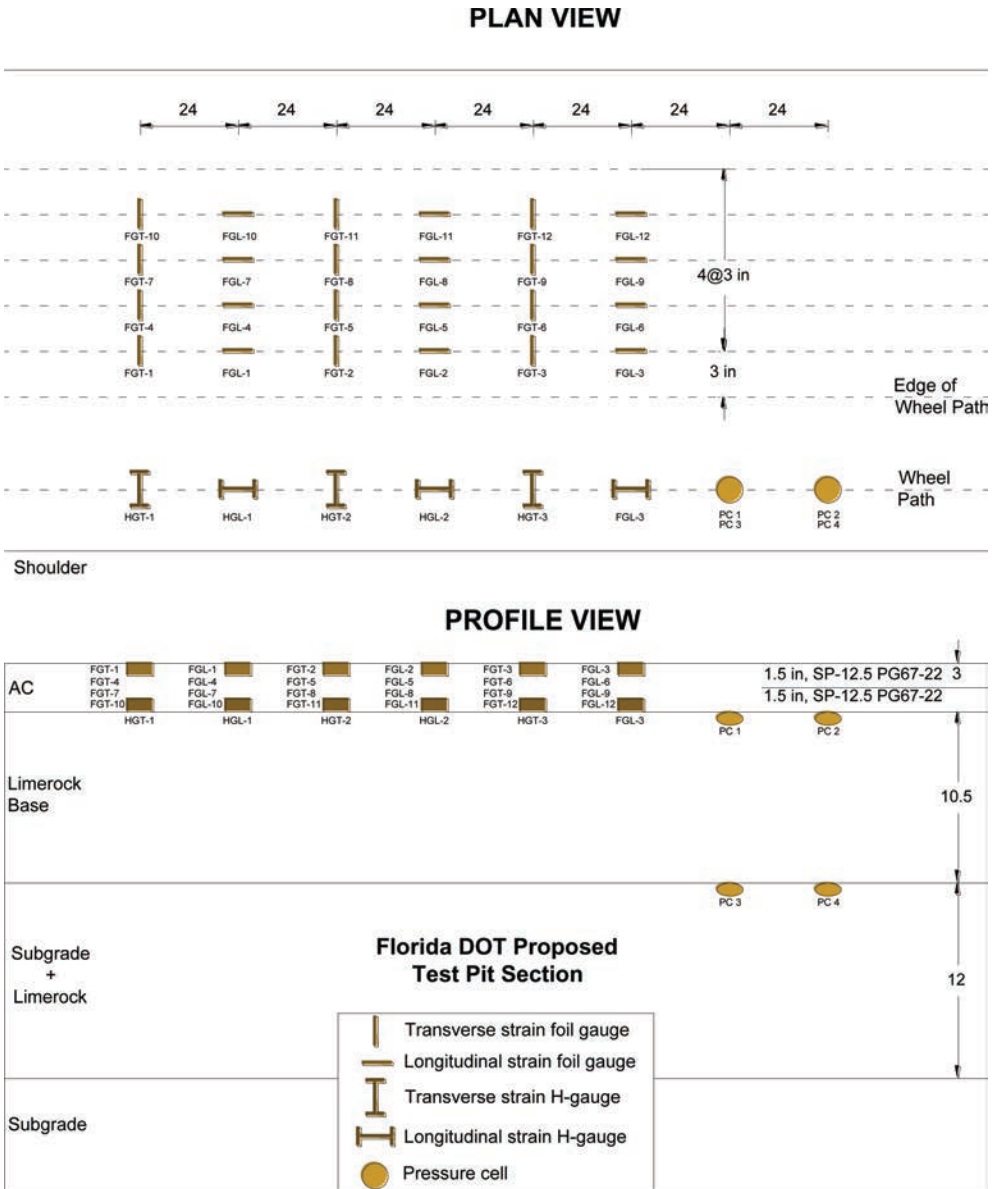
Pavement structure and instrumentation for the test pit section at Florida DOT facility.
